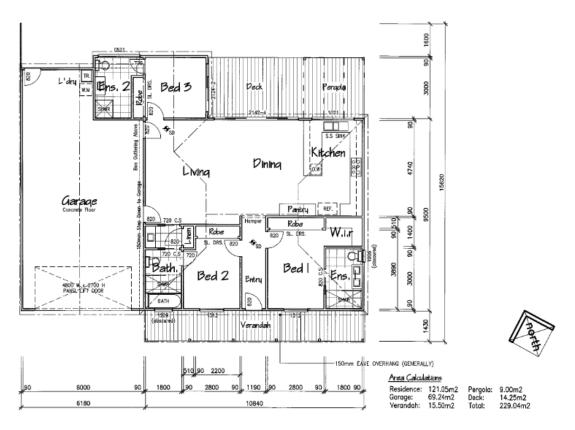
Proposed Floor Plan of Dwelling 1 & 2
